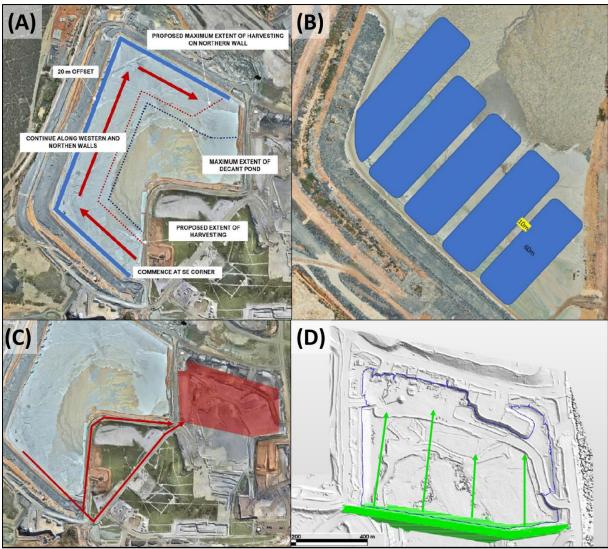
(A) Sequence of tailings excavation at TSF2, (B) Conceptual diagram of excavation cells at TSF2; (C) Haul truck route from TSF2 to TSF1 and proposed tailings deposition area at TSF1; (D) Proposed causeway layout (green) and extent of tailings deposition at TSF1 (blue line)
